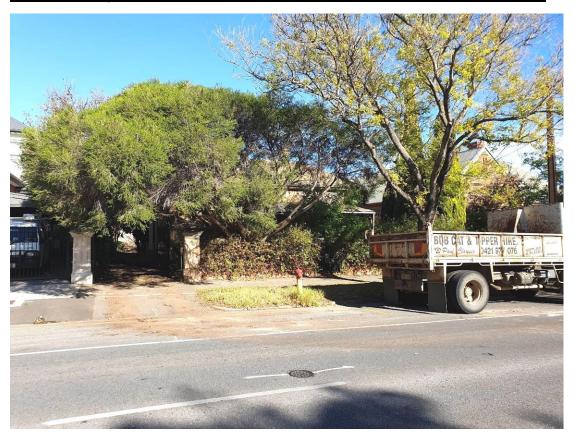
Subject site, viewed from the northern side of Barton Terrace West
